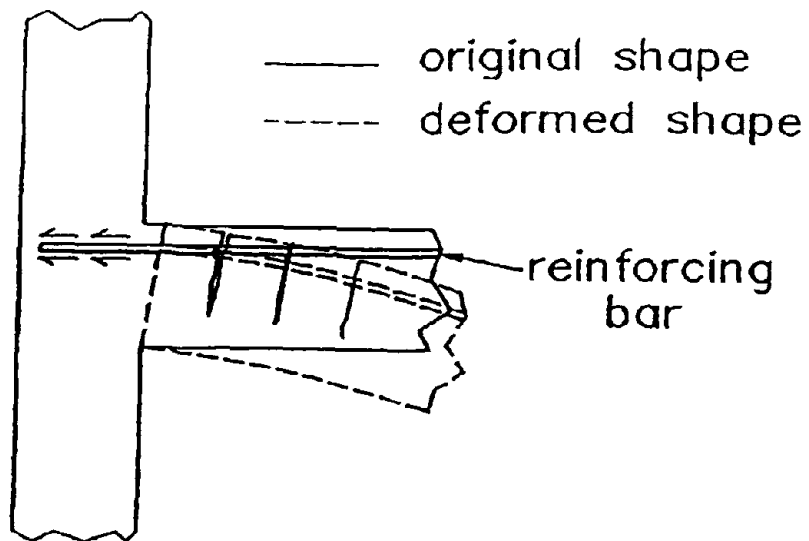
Bar Slip Mechanism in a Typical Reinforced Concrete Beam.
